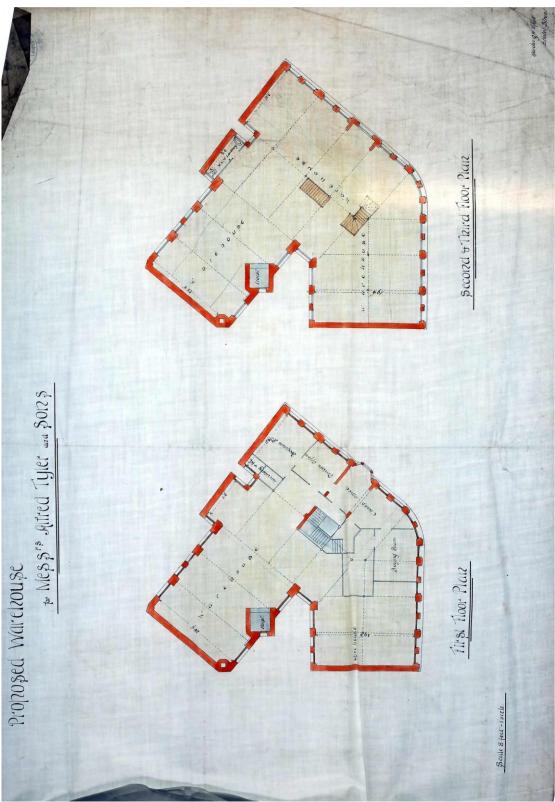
1897 proposals for first, second and third floor plans ROLLR 1897/4654. North to the right
